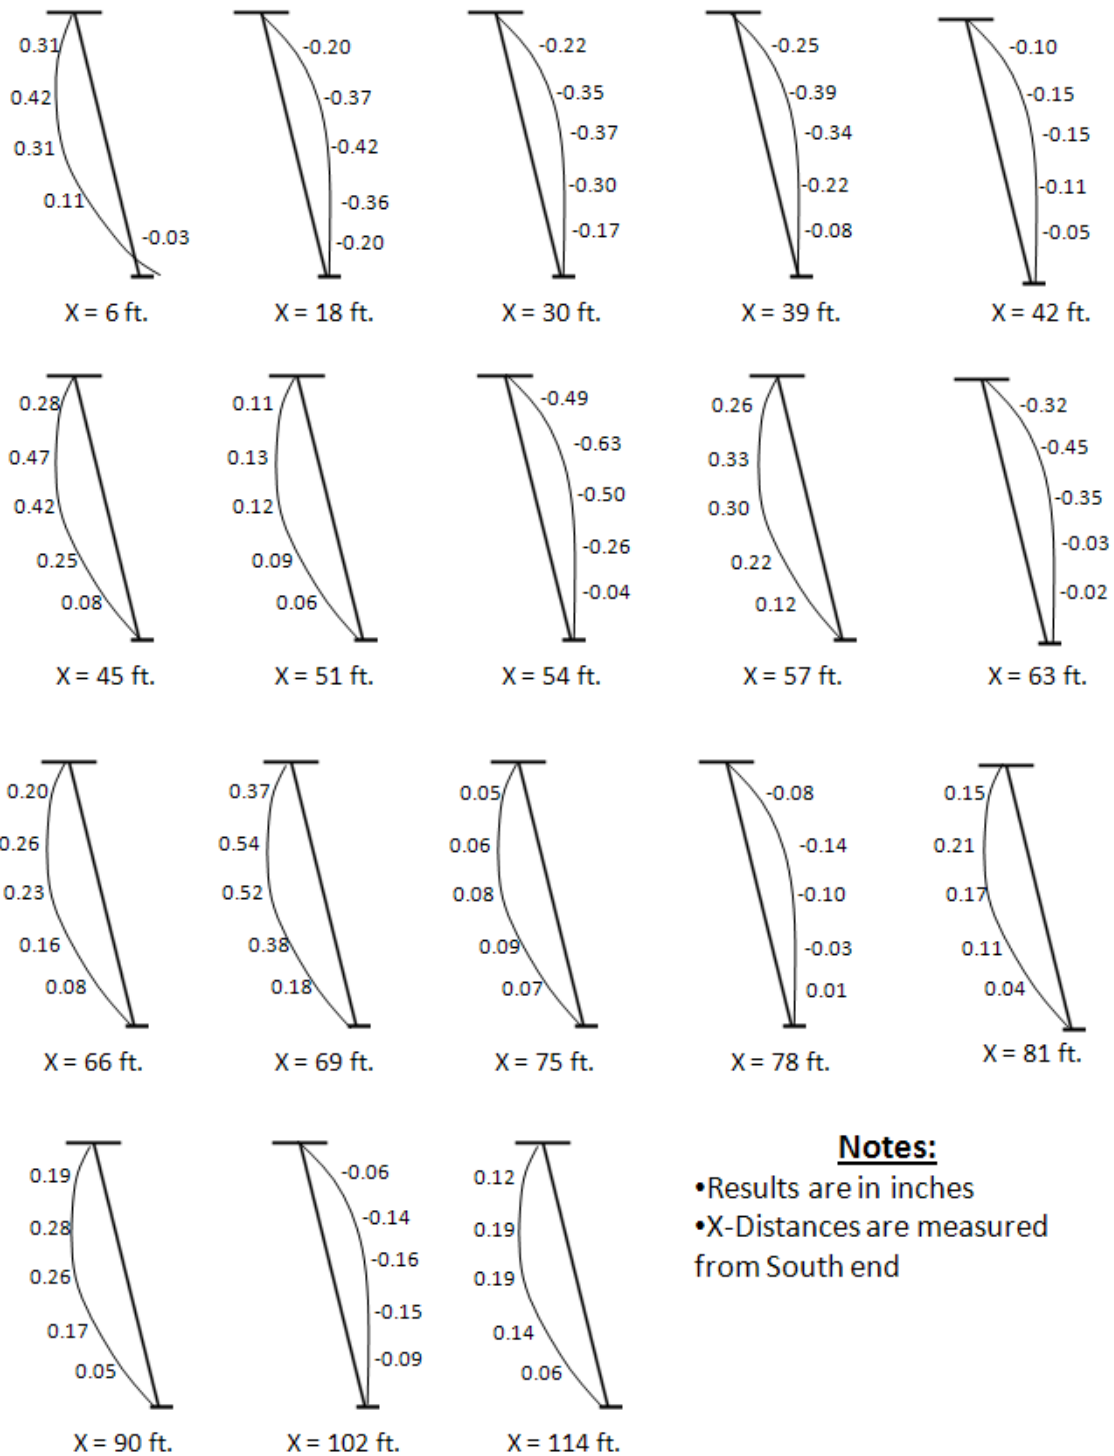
Exterior Girder Inner Web - After Casting of Deck
